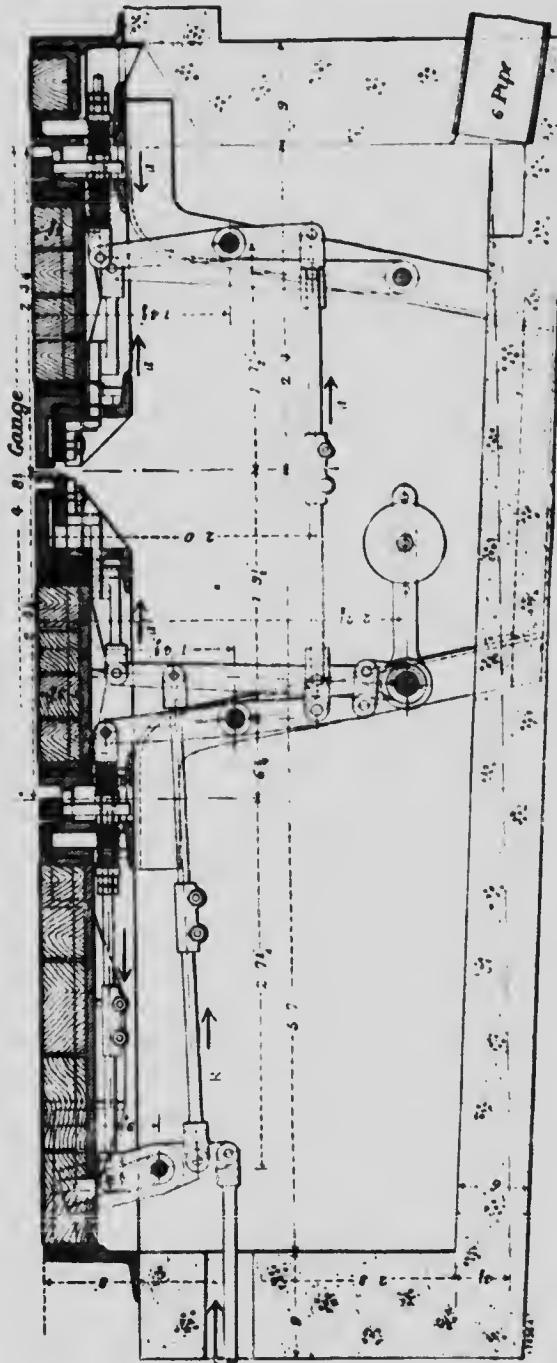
Vertical Conduit section showing Mechanism at Switching Point.
